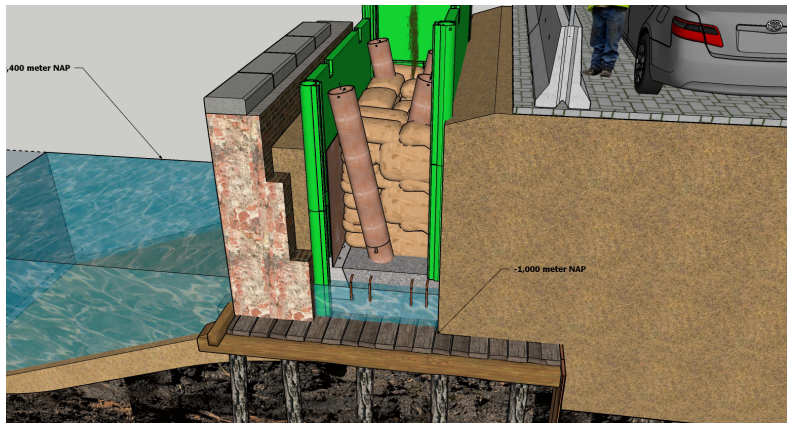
The sand bags are places onto the new flooring, with a protecting plate in front. [36]
